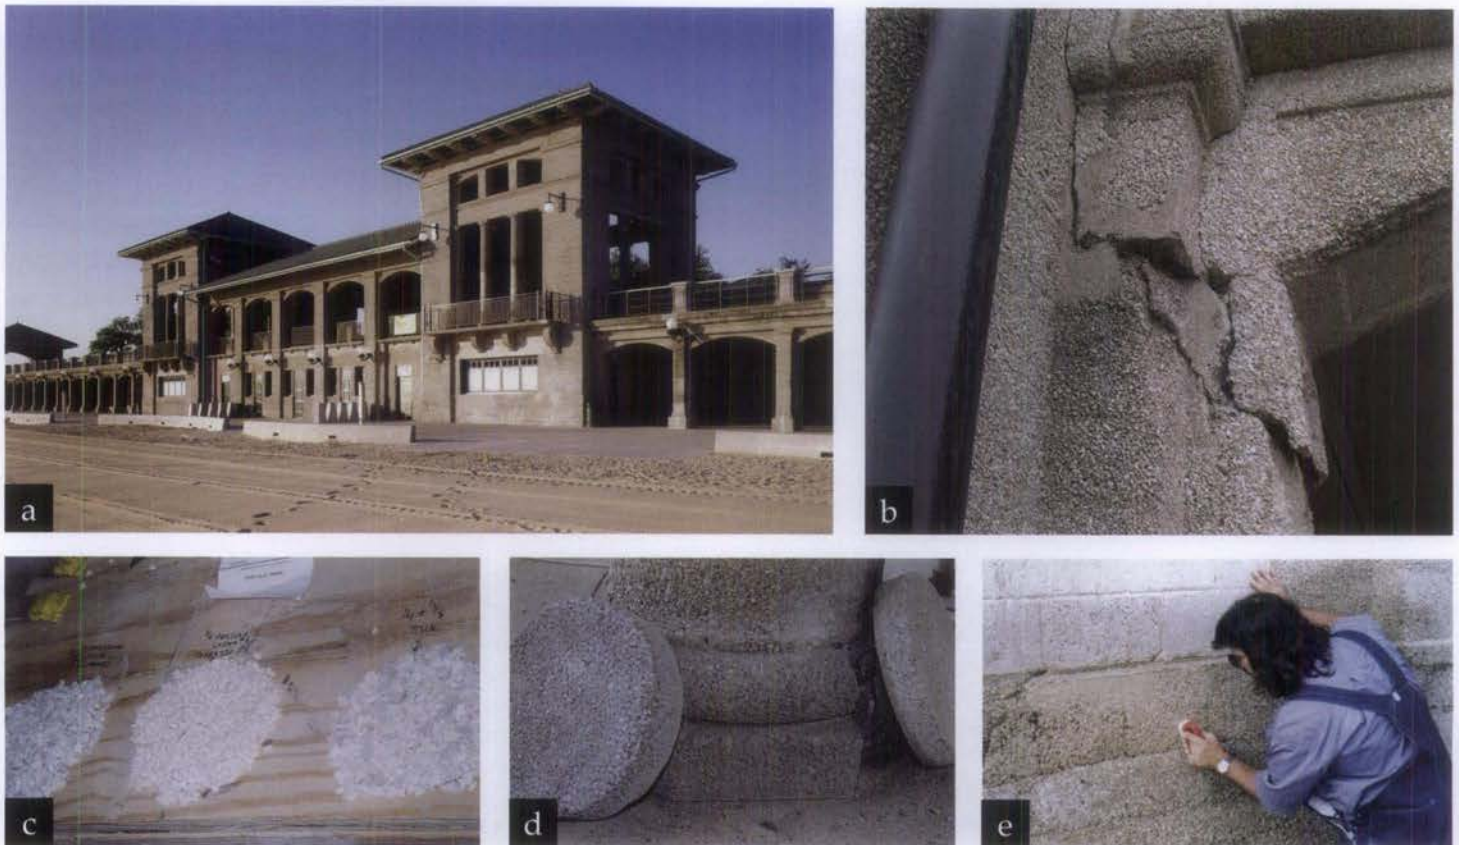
(a) The 63rd Street Beach House was constructed on the shoreline of Chicago in 1919. The highly exposed aggregate concrete of the exterior walls of the beach house was used for many buildings in the Chicago parks as an alternative to more expensive stone construction. Photo: Leslie Schwartz Photography. (b) Concrete deterioration included cracking, spalling, and delamination caused by corrosion of embedded reinforcing steel and concrete damage due to cyclic freezing and thawing. (c) Various sizes and types of aggregates were reviewed for matching to the original concrete materials. (d) Mock-ups of the concrete repair mix were prepared for comparison to the original concrete. Considerations included aggregate type and size, cement color, proportions, aggregate exposure, and surface finish. (e) The craftsman finished the surface to replicate the original appearance in a mock-up on the structure. Here, he used a nylon bristle brush to remove loose paste and expose the aggregate, creating a variable surface to match the adjacent original concrete.
